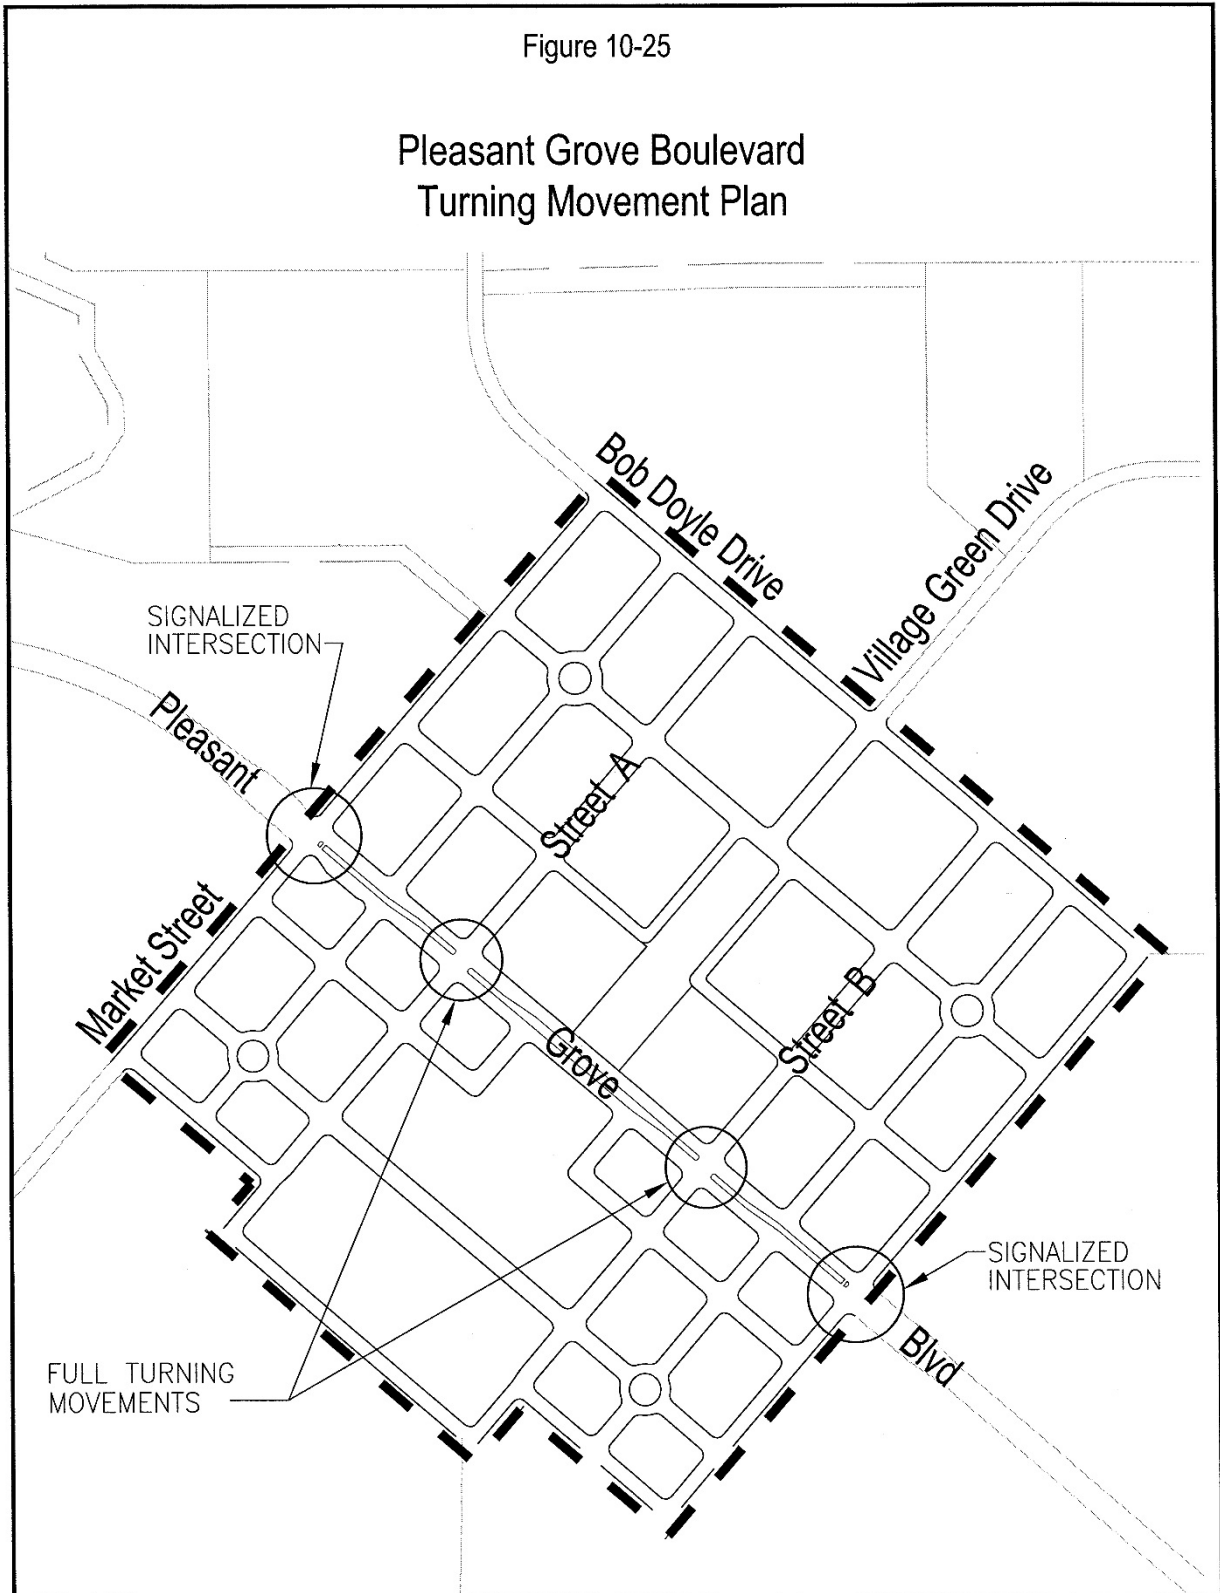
Pleasant Grove Boulevard Turning Movement Plan
